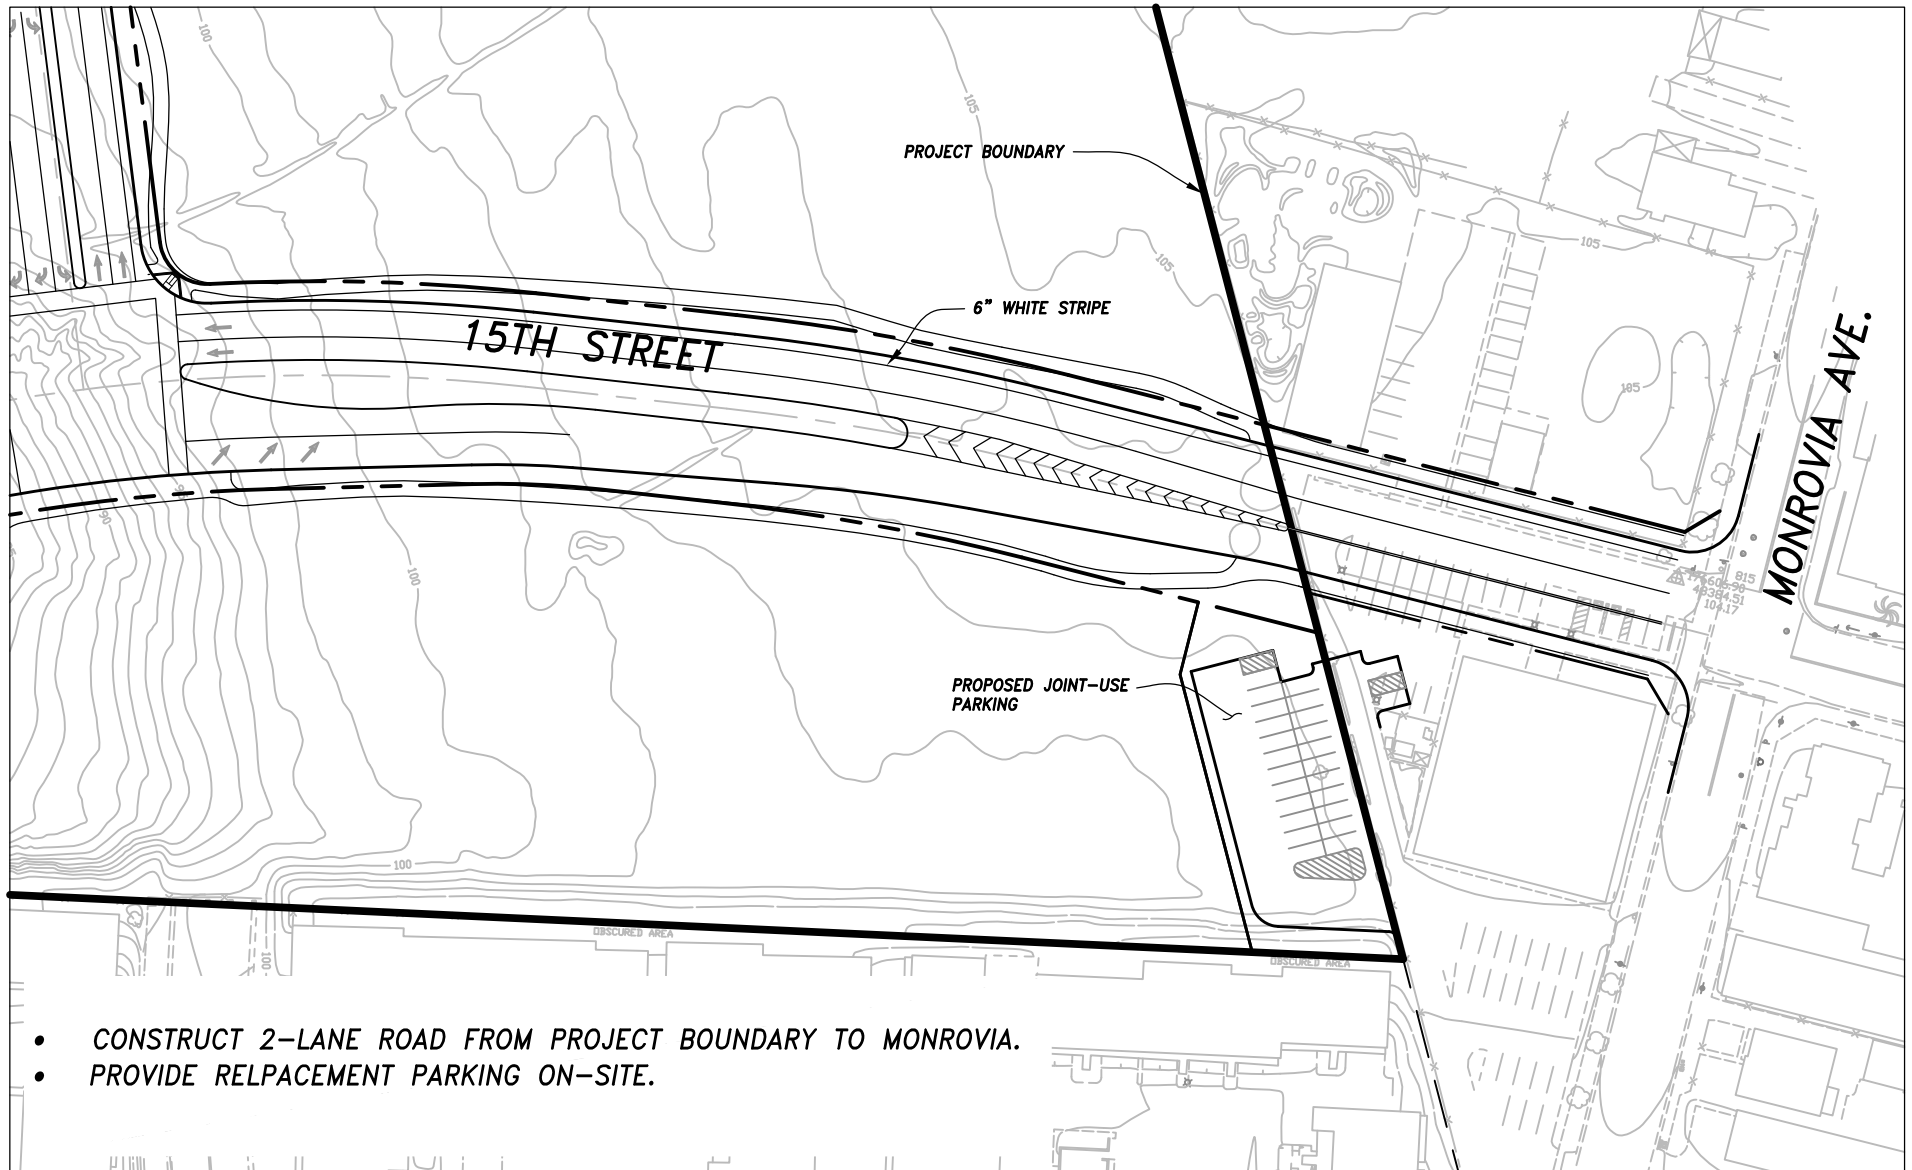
15th Street Entry and Off-Site Improvements
